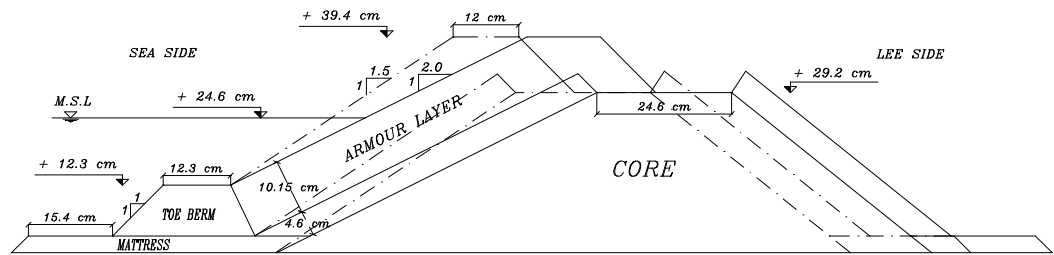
Tested Cross sections (slope = 1:1.5 & 1:2)
